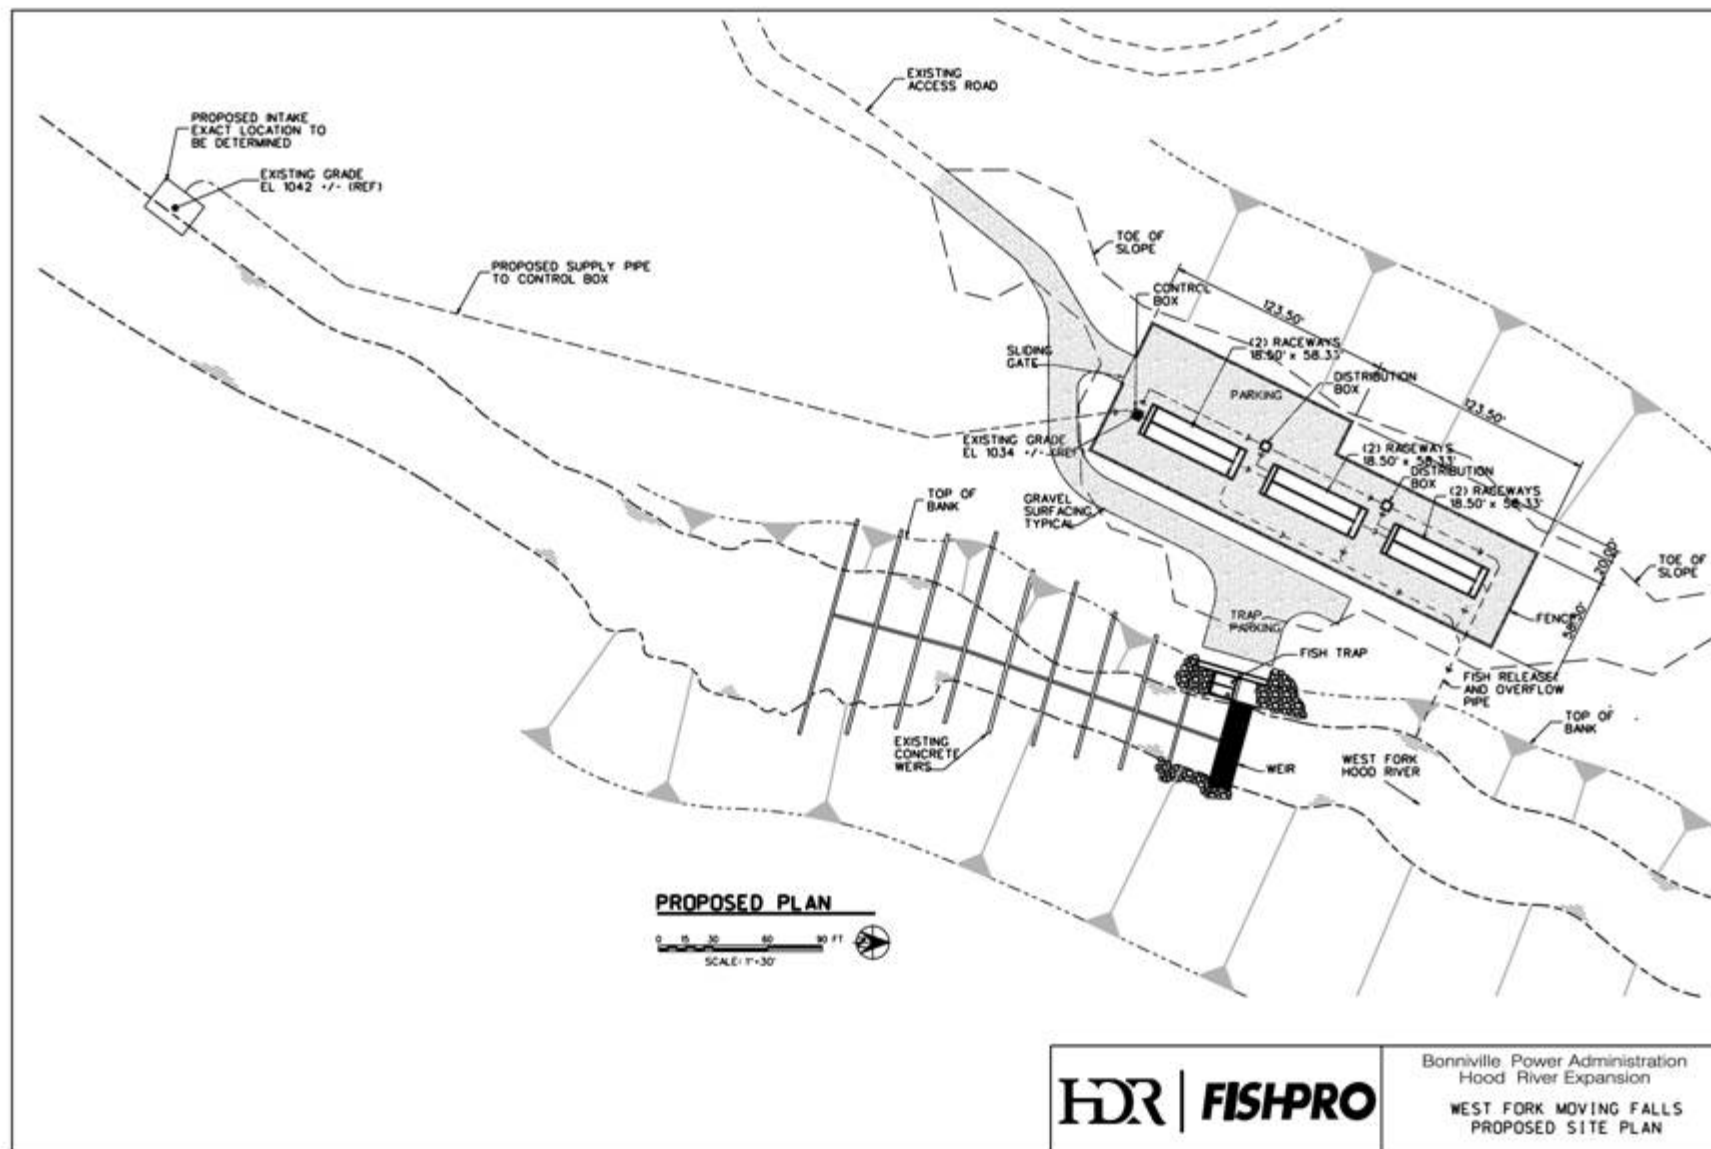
Moving Falls Facility with Conceptual Level Details of Site
